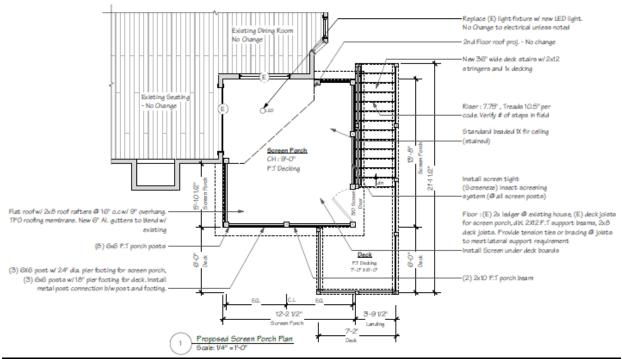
The proposed plan for the porch, deck, landing, and stair.
